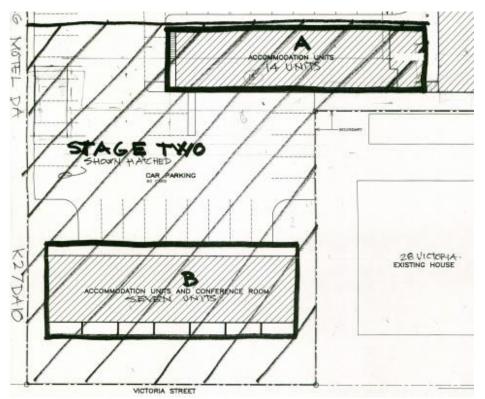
Layout of Stage 2 of the motel consisting of the two storey Block A and single storey Block B fronting Victoria Street
